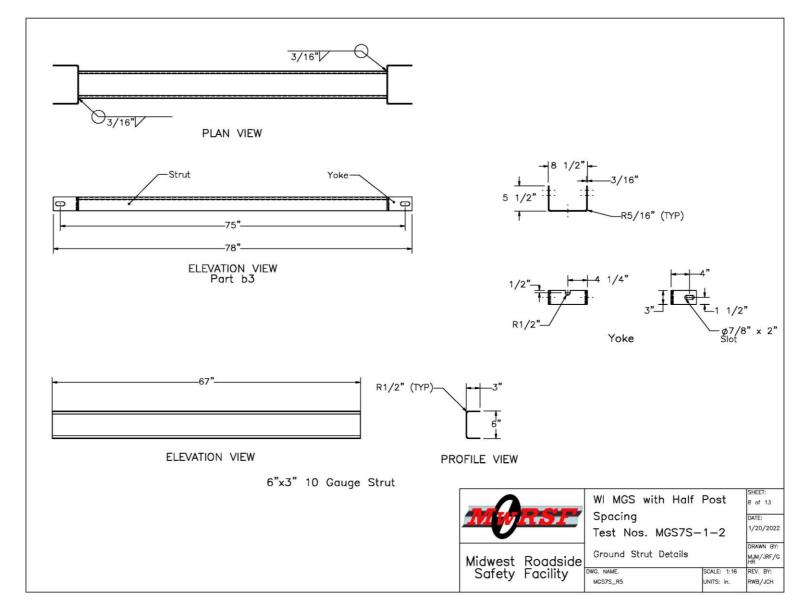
Ground Strut Details, Test Nos. MGS7S-1 and MGS7S-2
